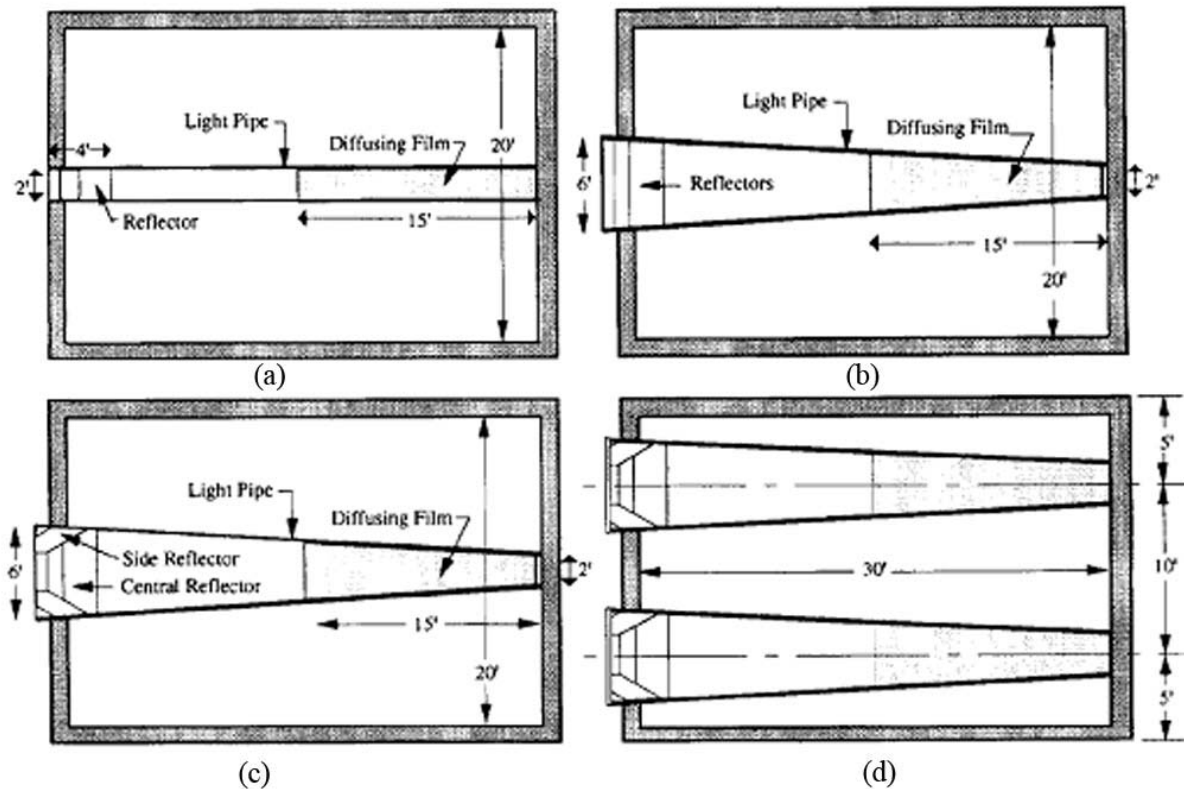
Plans showing the four configurations of light pipes. (a) Basecase light pipe, (b) rectangular section light pipe with central reflectors, (c) rectangular section light pipe with side reflectors, (d) two trapezoidal section light pipes with side reflectors. *Source: Beltran, Lee, Selkowitz (1997).
